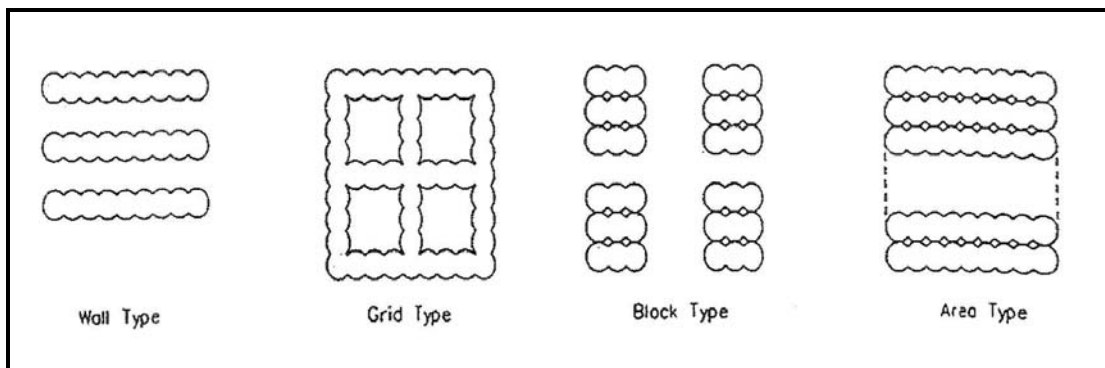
, Deep Soil Mixing Treatment Patterns (Ground Improvement Methods – August 2006)
